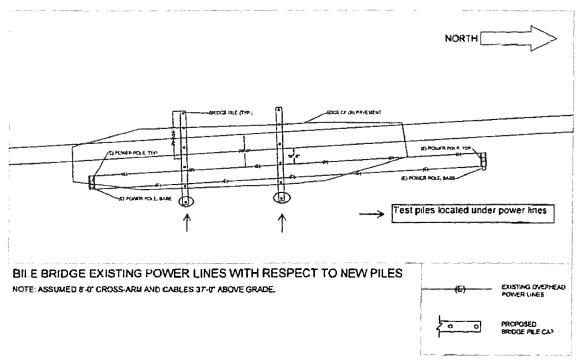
Existing Bile Bridge Overhead Electrical Line (Plan)
